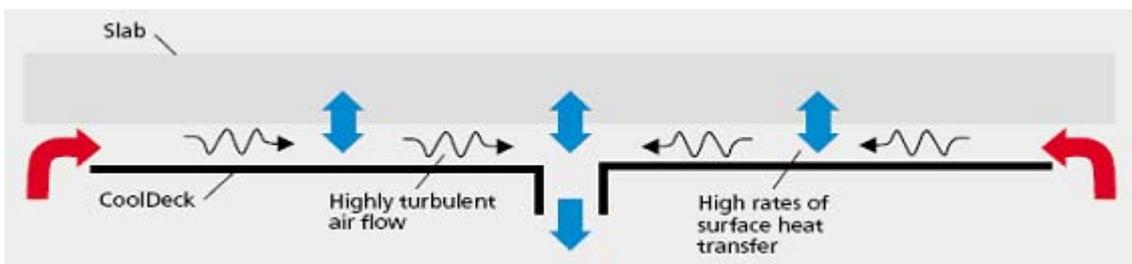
Stevenage Borough Council" building - Scheme of the working principle of the PCM based ceiling
